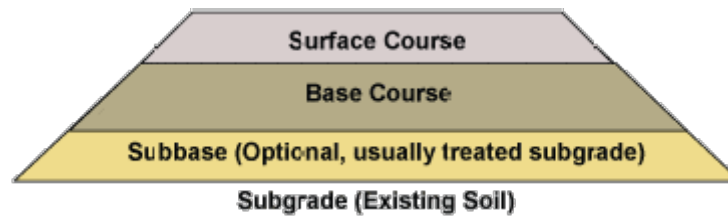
Flexible pavement scheme (The Constructor, 2020)
